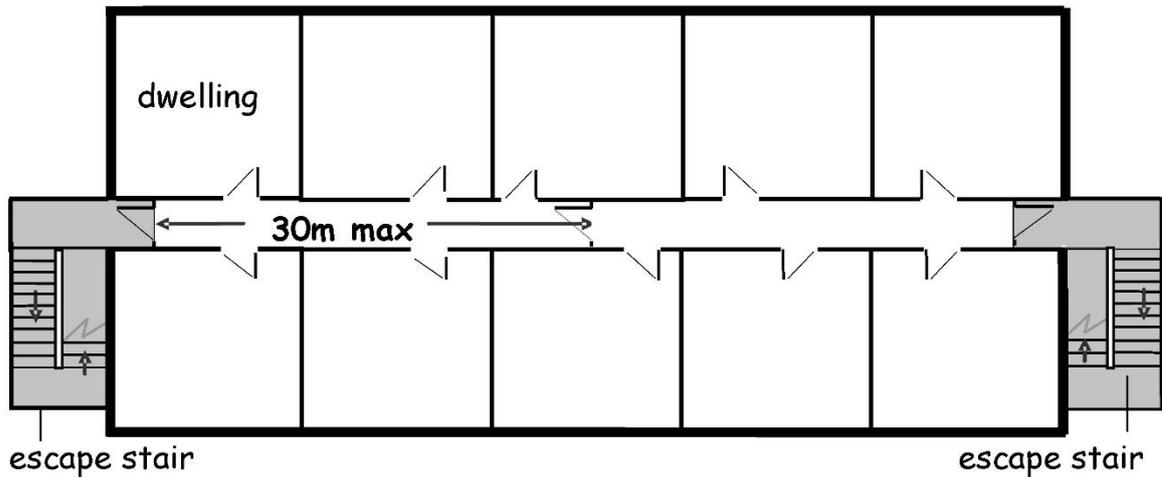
Upper floor arrangement where flats are served by more than one escape stairway
